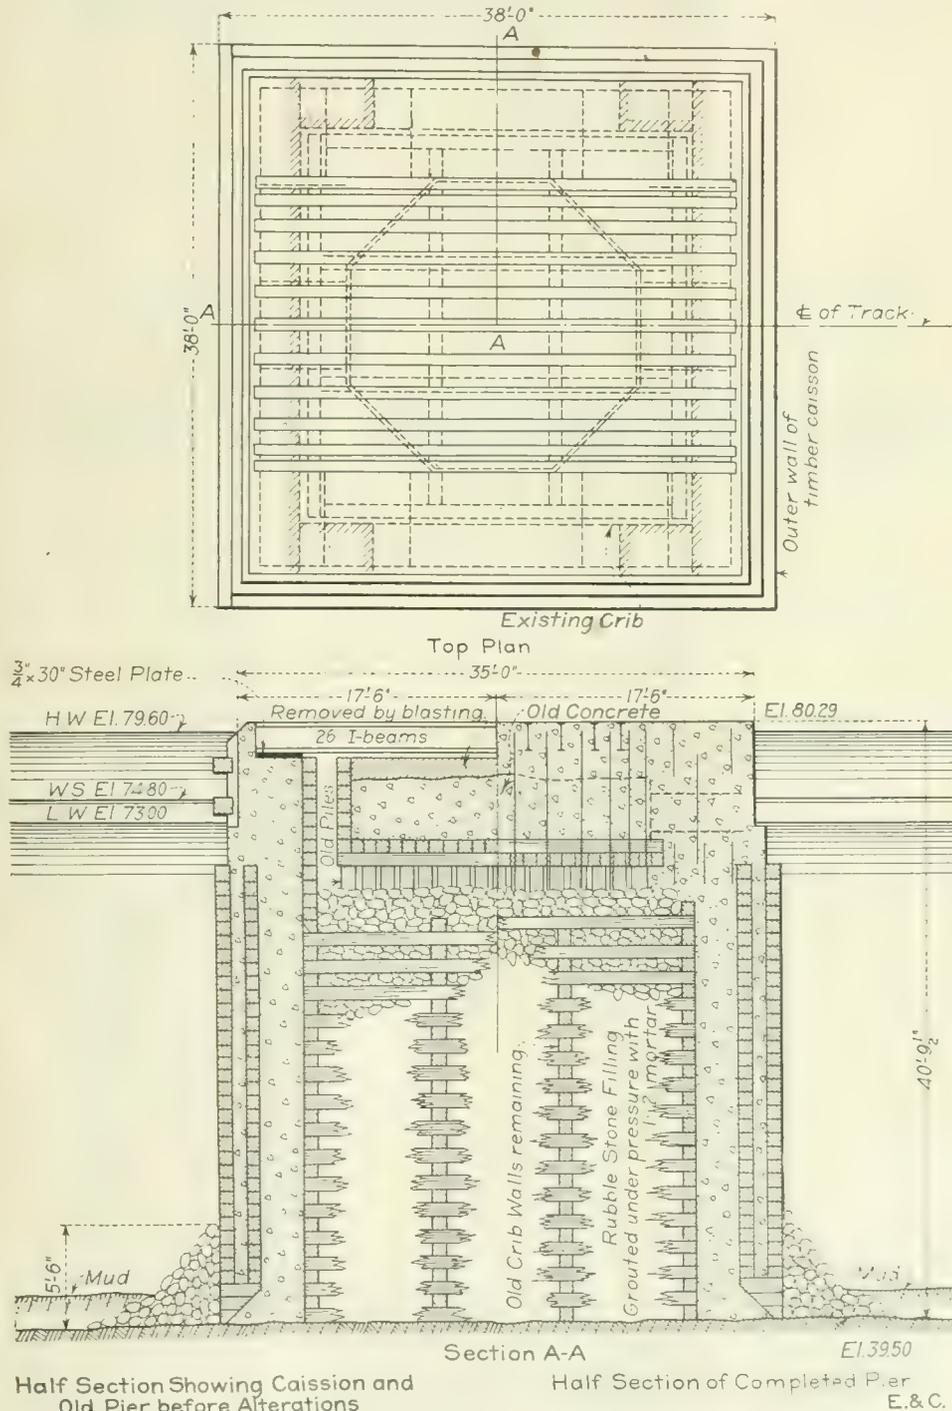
Plan, Half Section of Old Pivot Pier and Half Section of Completed Pivot Pier of Richelieu River Bridge.
